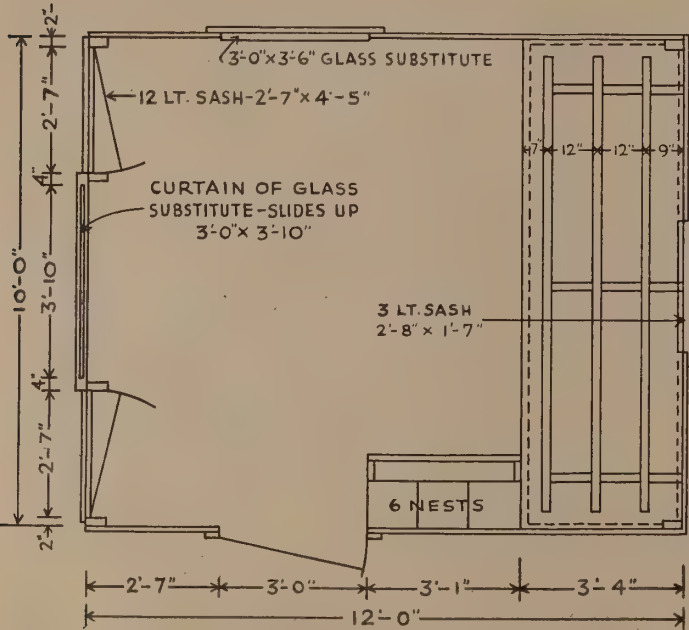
Floor plan of the New Jersey house. Roosts and nests will be omitted when house is used for brooding.
